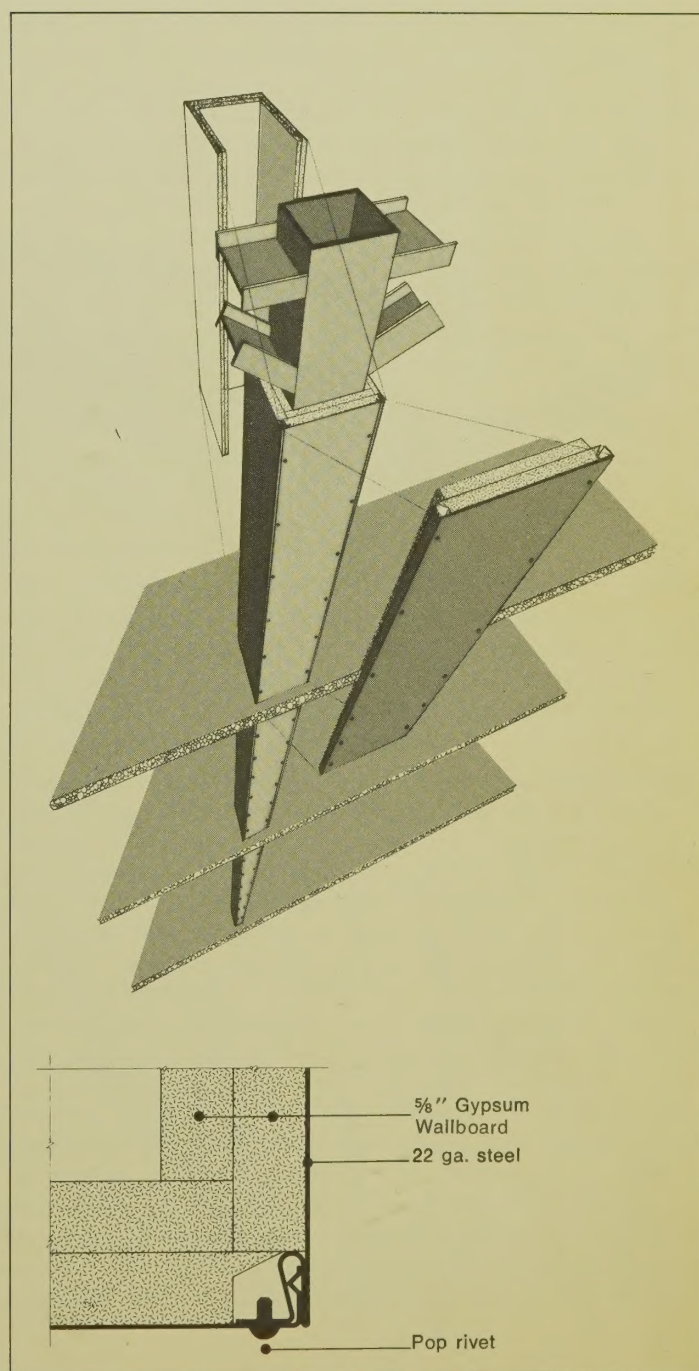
Fire protection of the HSS columns utilizing sheet steel - gypsum wallboard laminate column covers.
